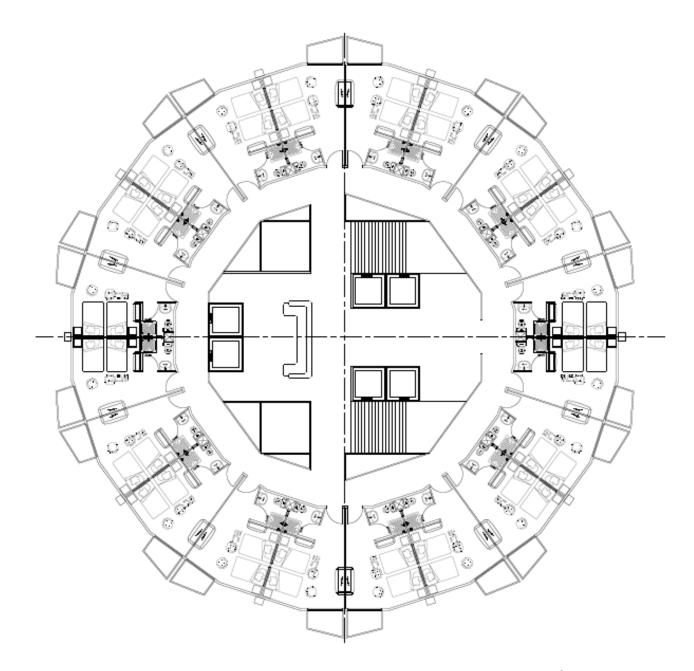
Typical Floor for Guest Rooms (starting from 1st floor up to 26th Floor) (Item c)
